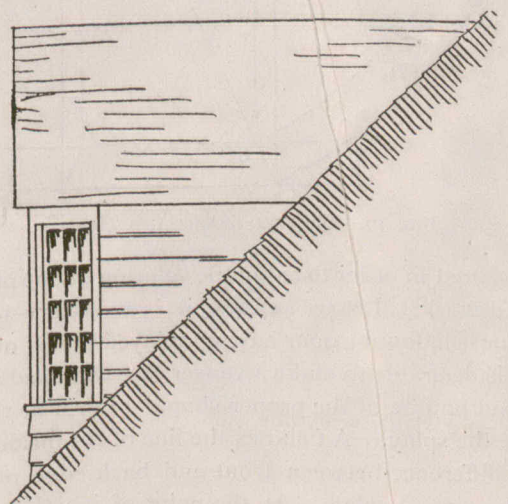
SIDE ELEVATION—DORMER WINDOW.
